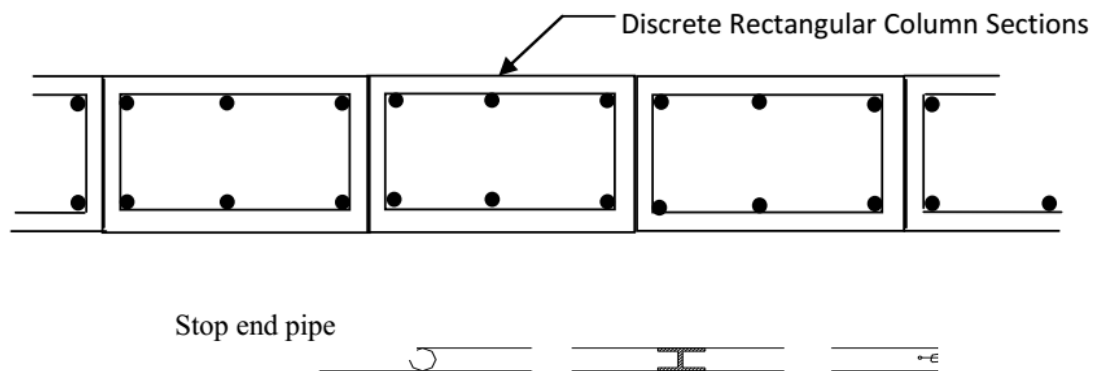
Diaphragm Wall and Joints between the Panels in Diaphragm Walls
